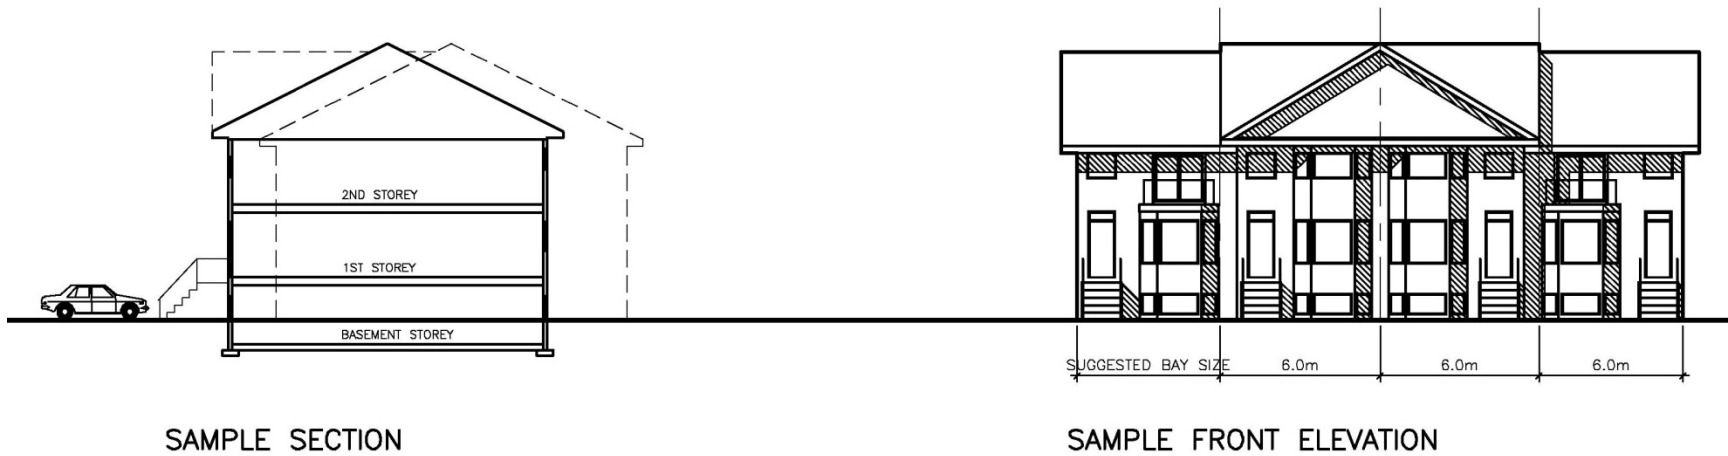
Sample 2 Storey & 2 ½ Storey Townhouse without Garage
